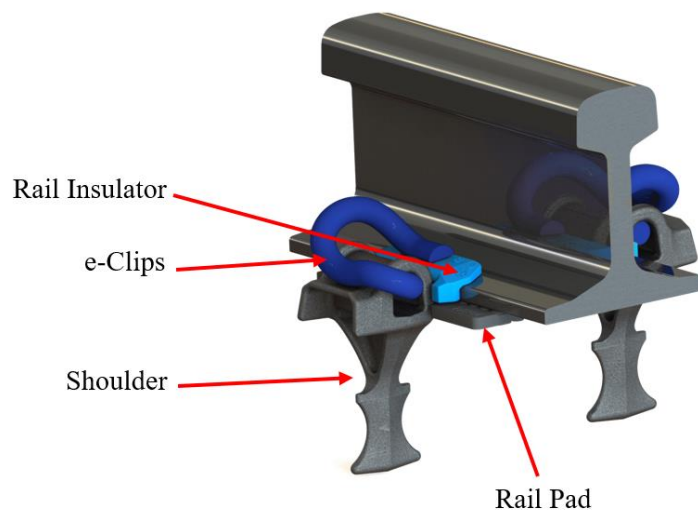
Components of a typical rail-sleeper fastening system (Pandrol, accessed on 20/12/2021)
